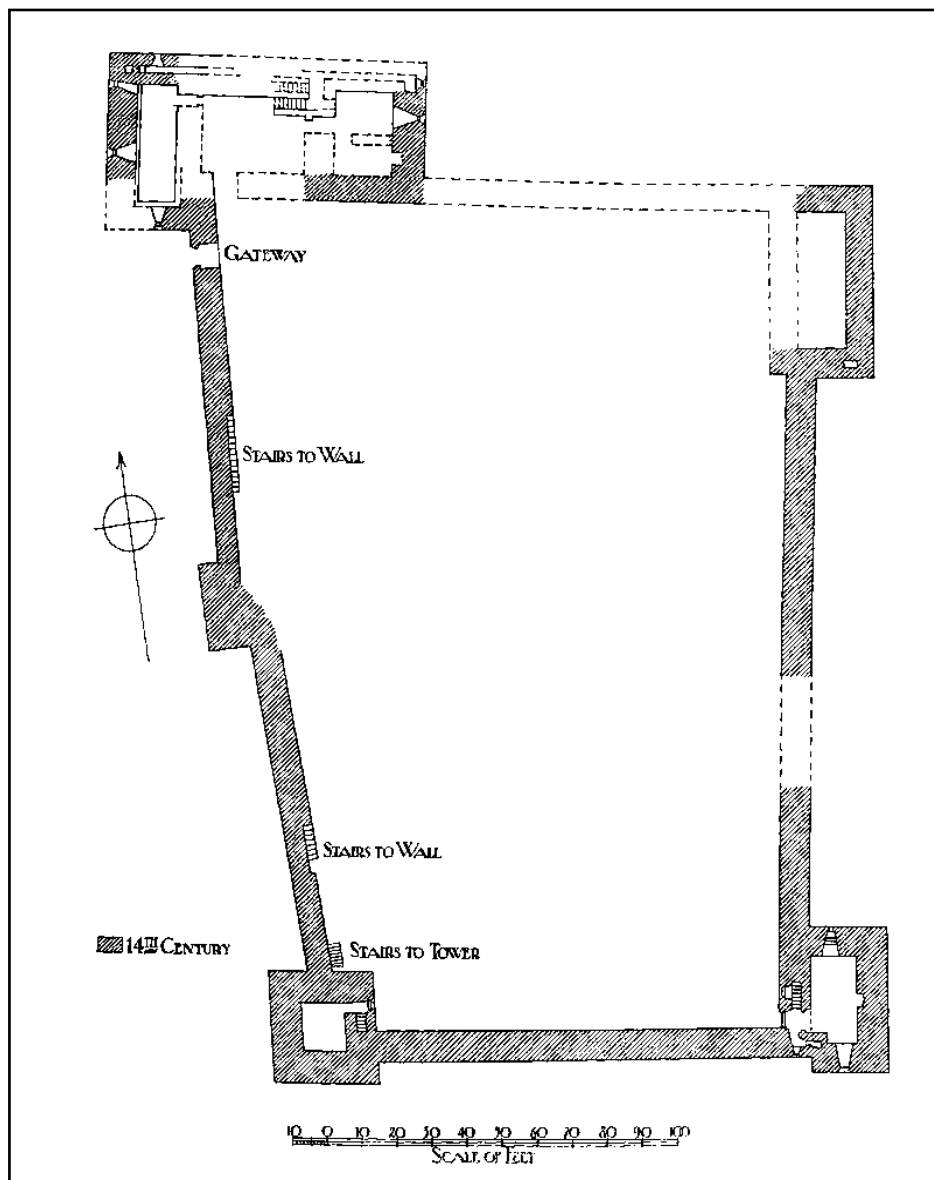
Plan of Gleaston Castle from Kendal (1906)
